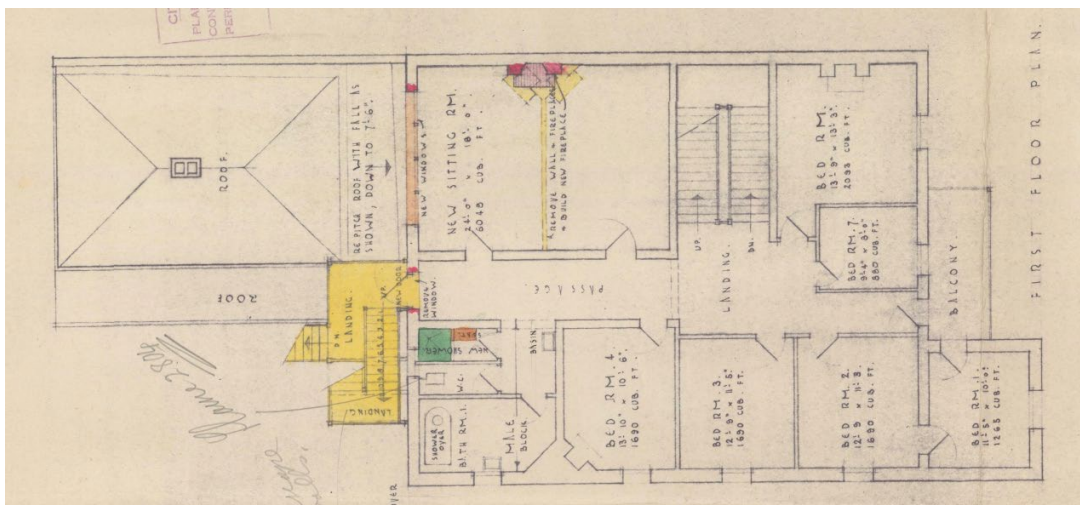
First floor plan in 1954. Note new fire escape (yellow) and rear windows (orange) proposed. (BP 3930, 1954)
